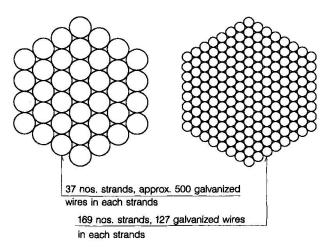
Main cable alternatives. Left: air spun cable section. Right: prefabricated cable section.
